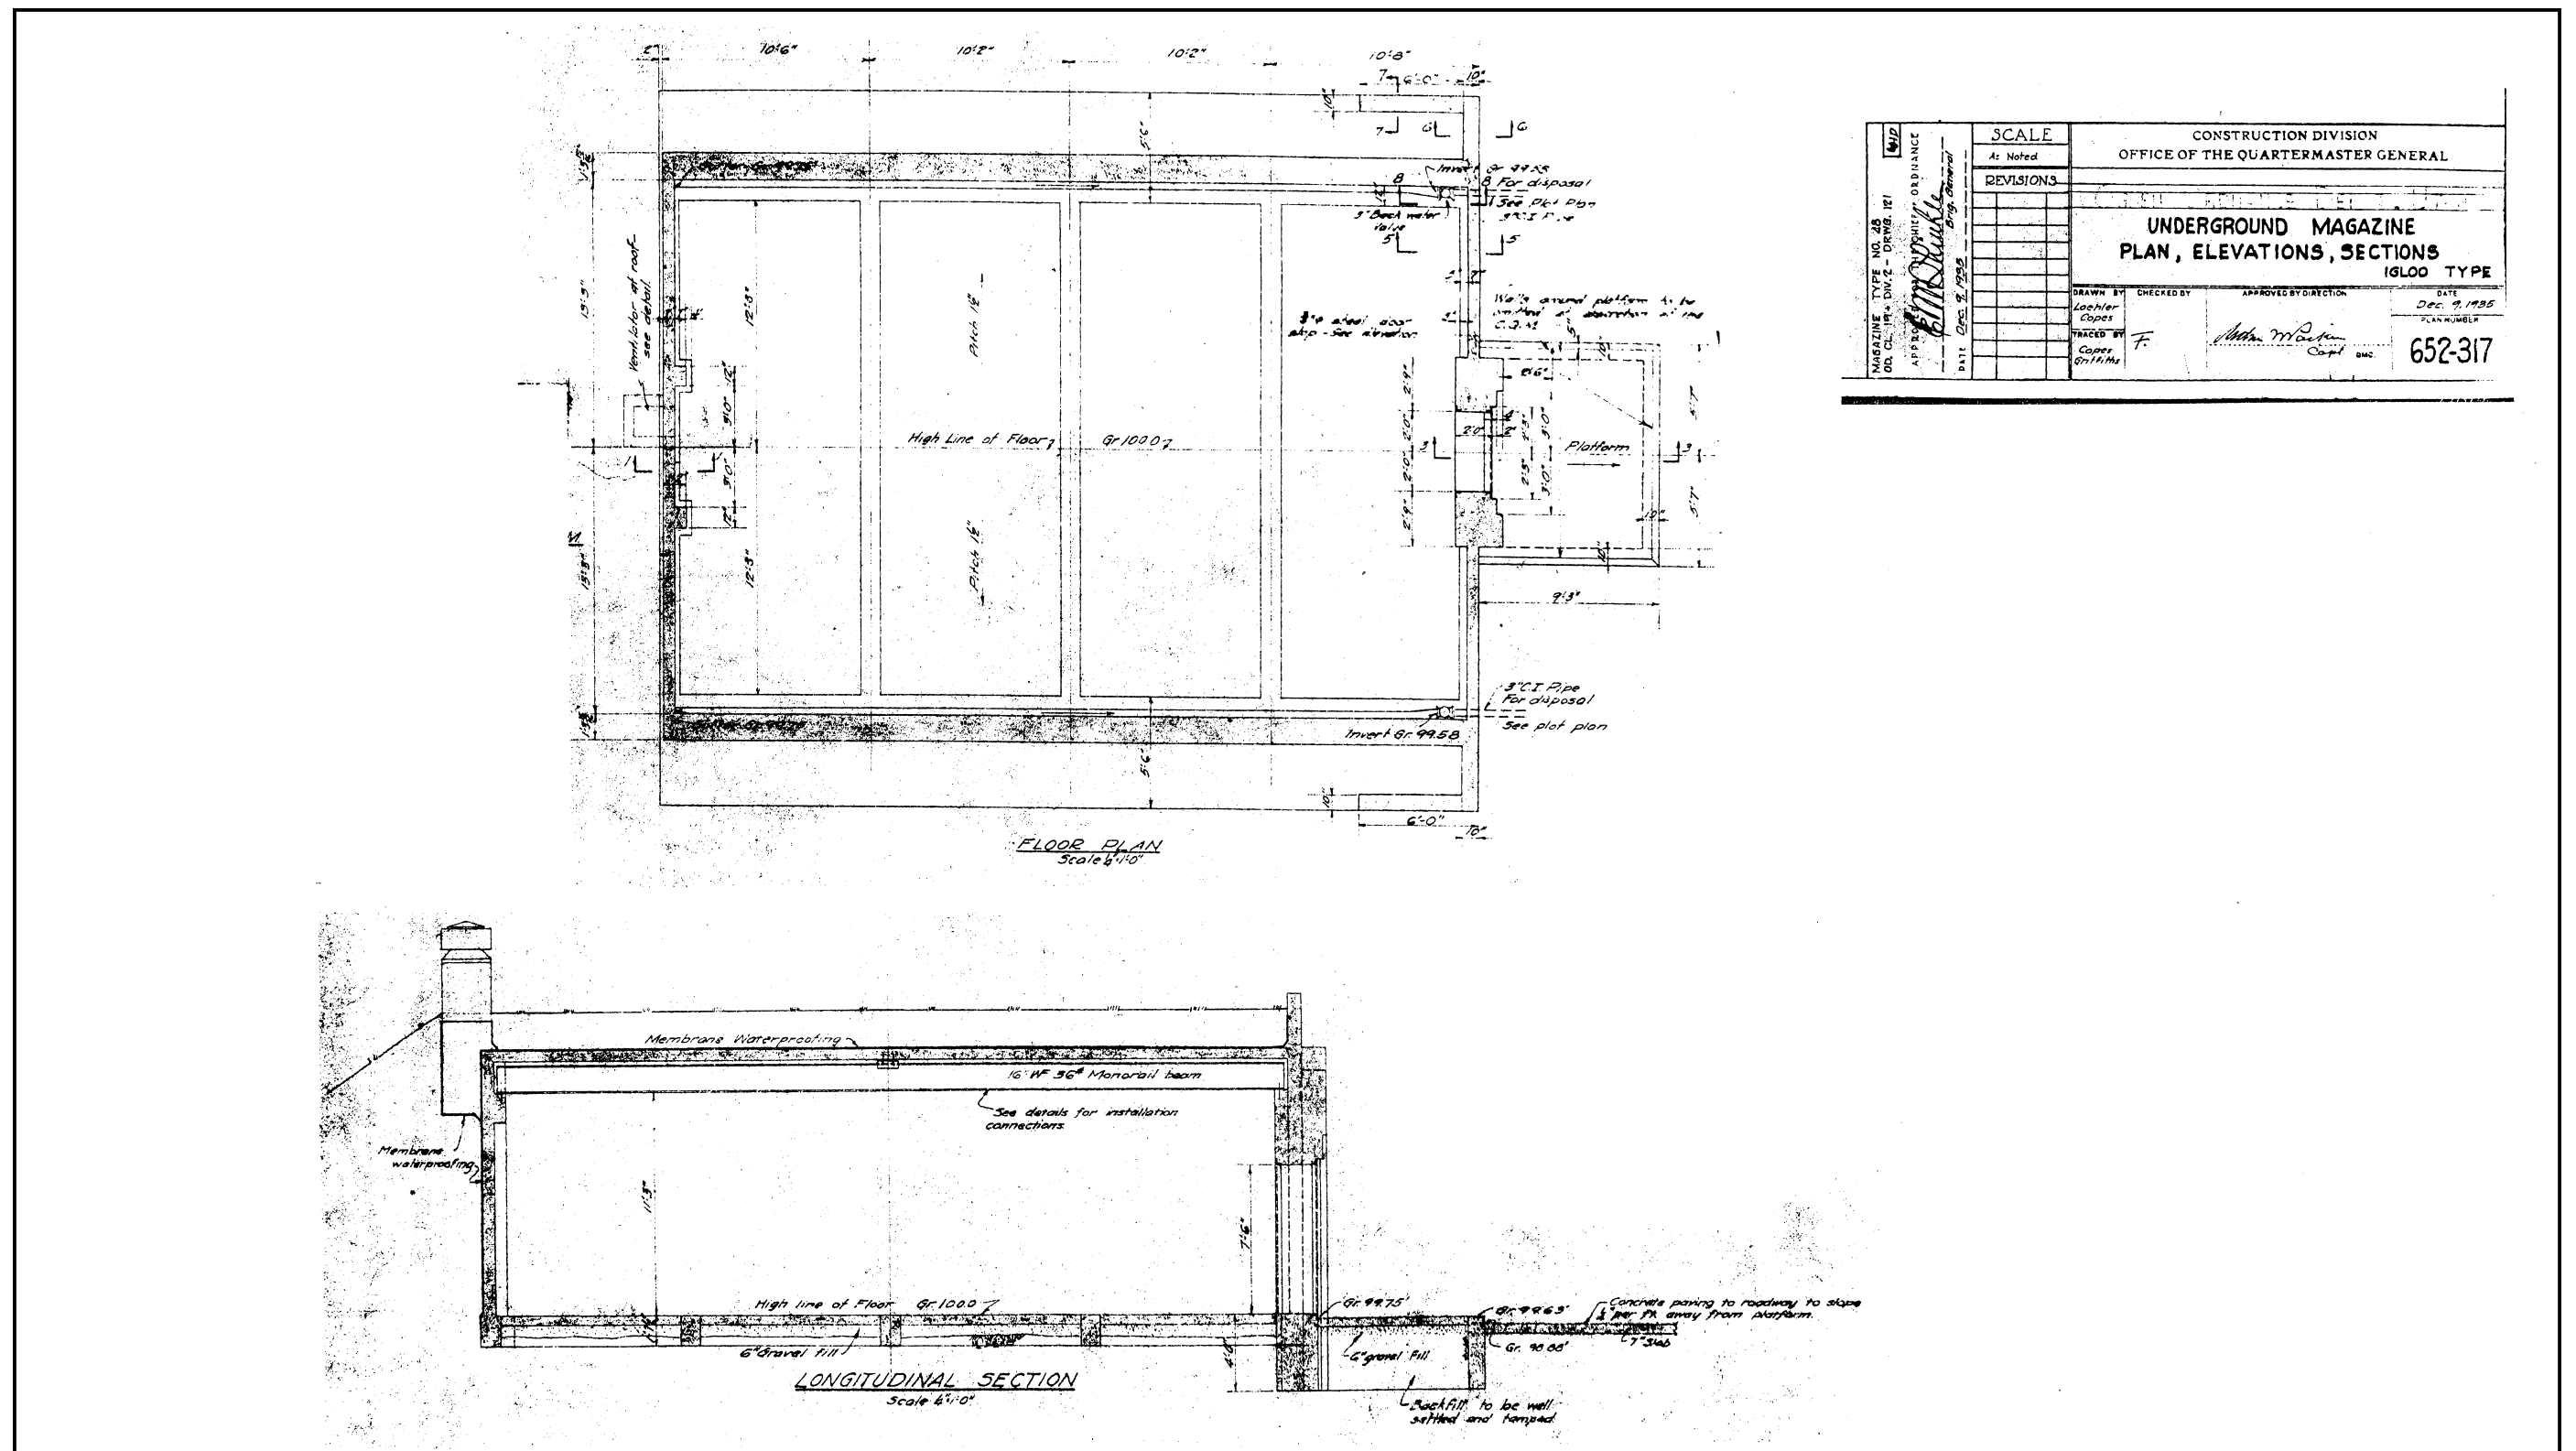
Floor plan and longitudinal section for underground magazine, Drawing 652-317.
